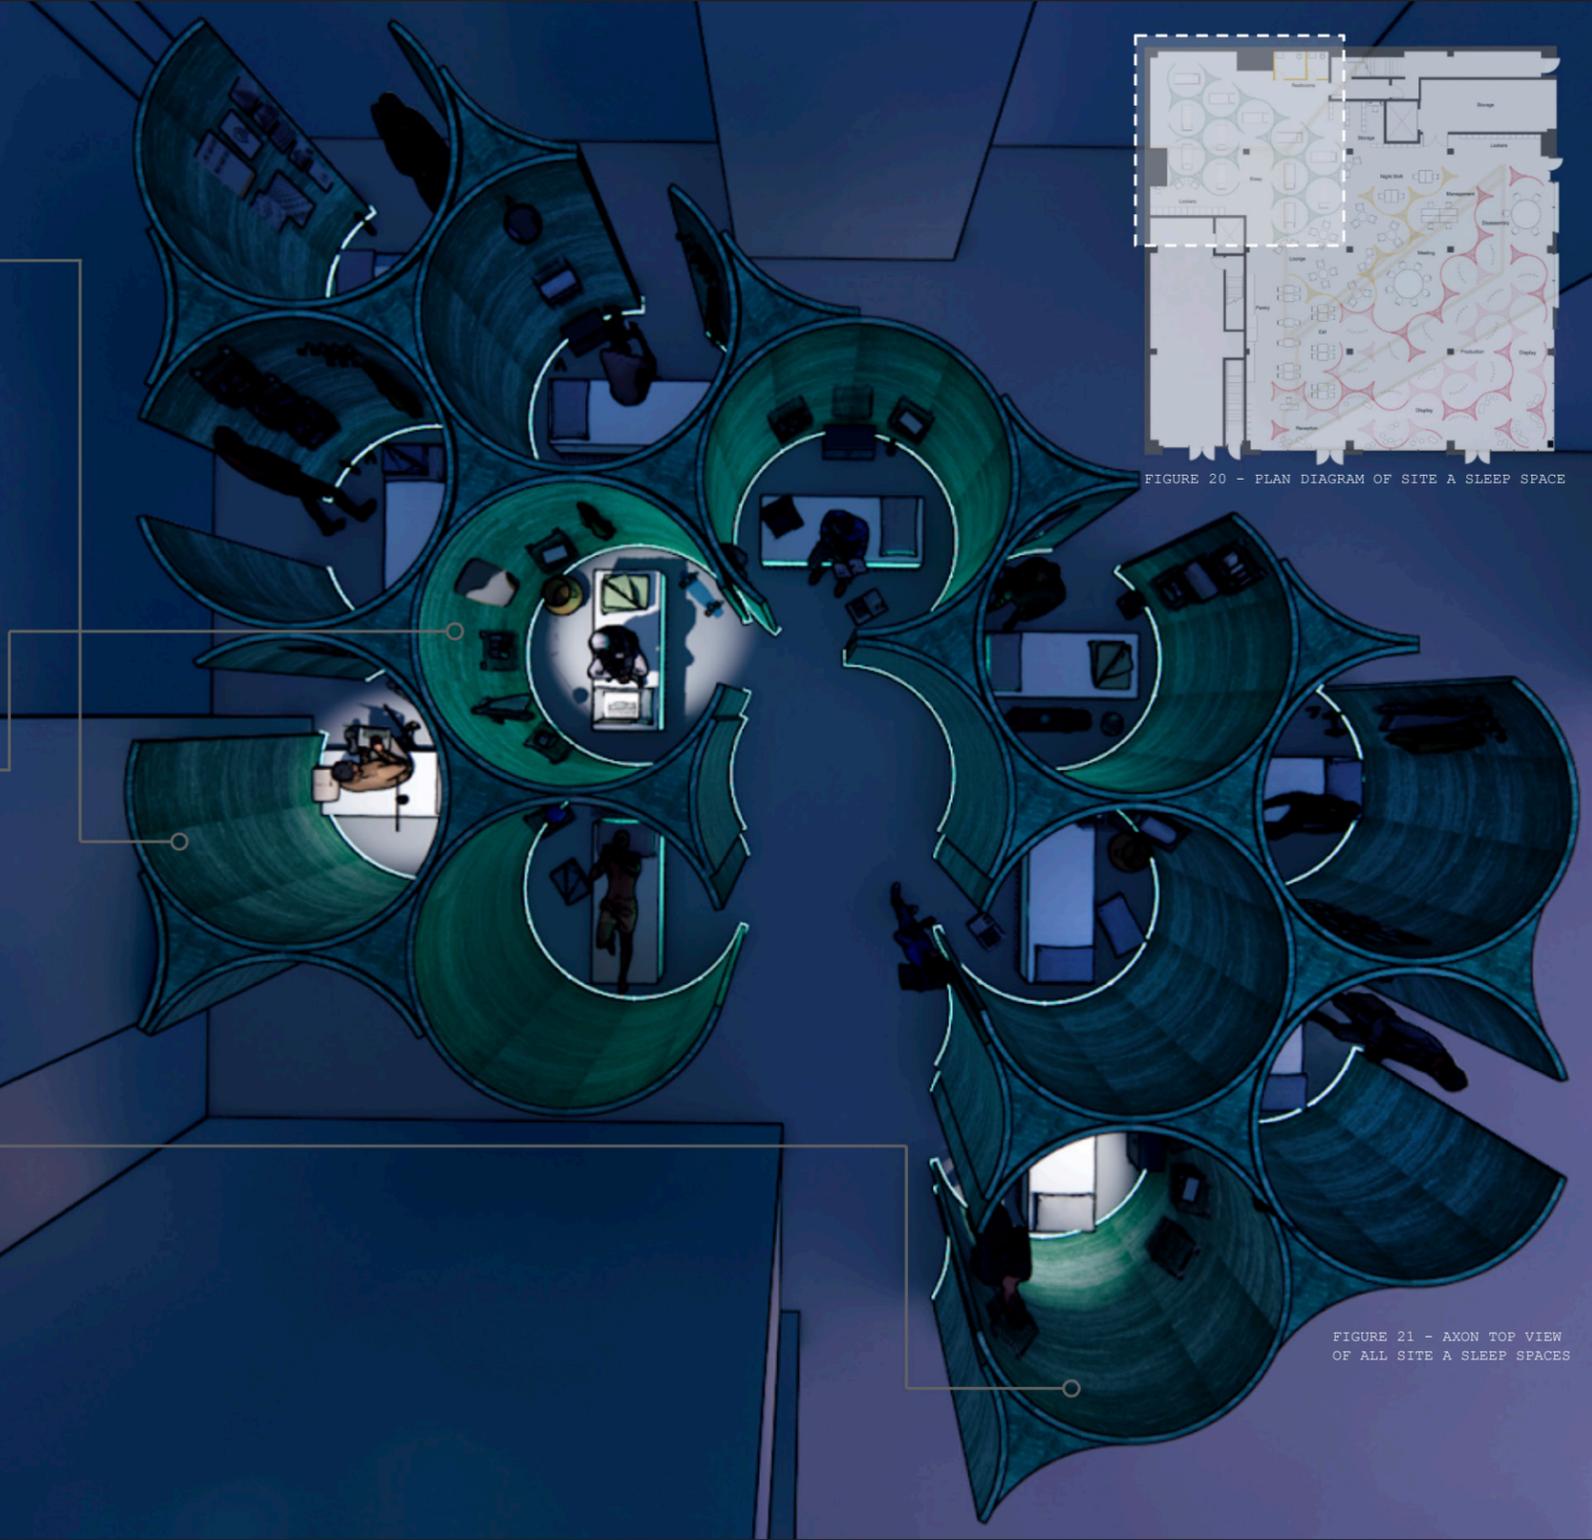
PLAN DIAGRAM OF SITE A SLEEP SPACE
